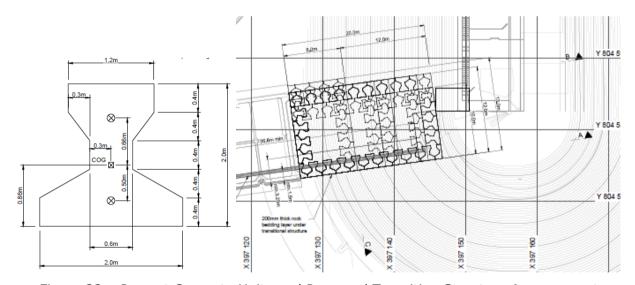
Precast Concrete Units and Proposed Transition Structure Arrangement
